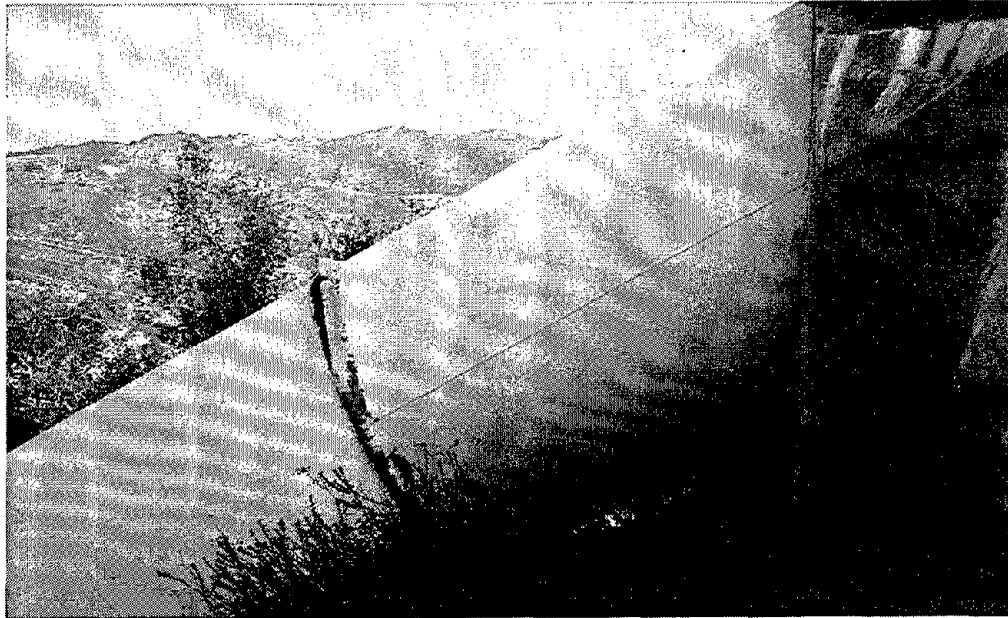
North slope of Terminal Hill 77-inch WSP supported on concrete saddles.
